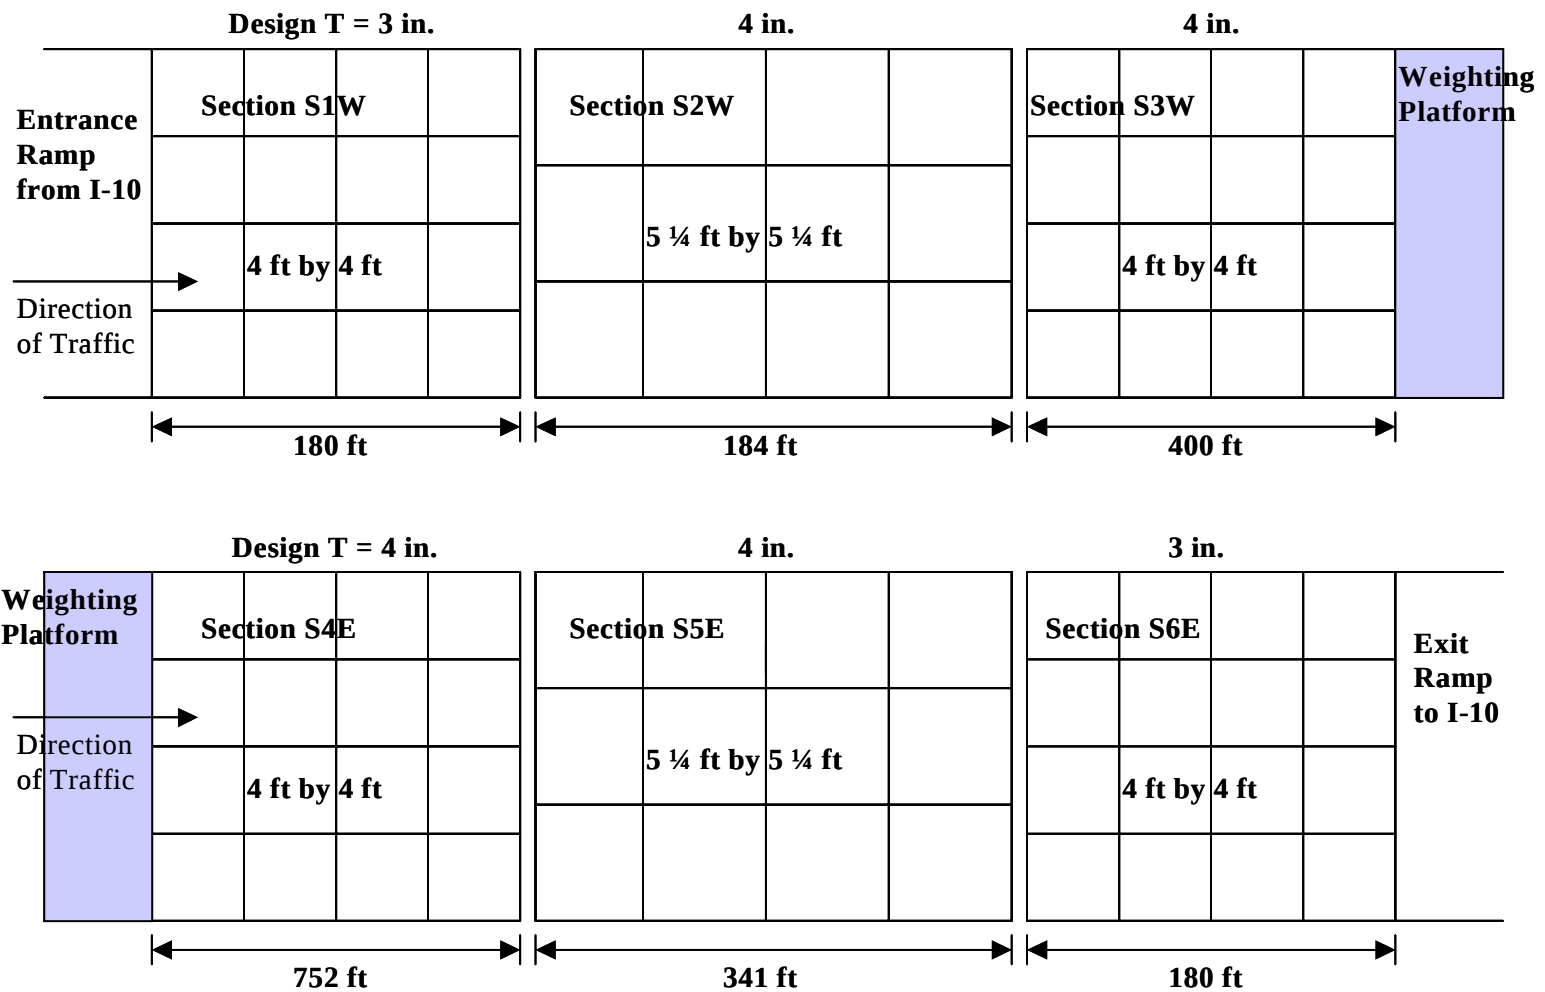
Design Layout of the Ellaville Weigh Station UTW Test Sections
